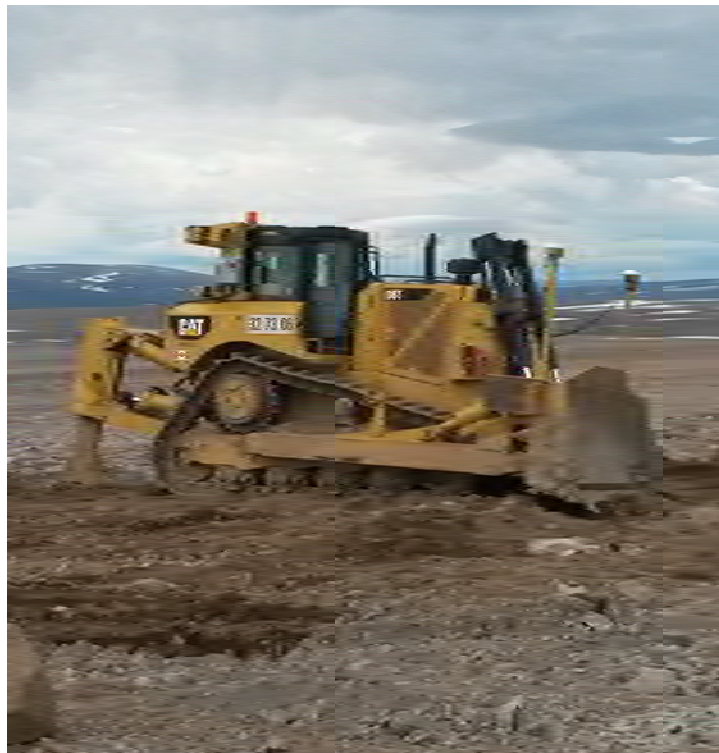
West Ditch excavation began at station 0+438, June 27, 2021.
